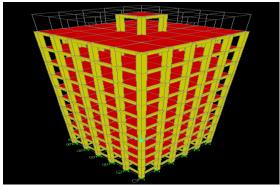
10 Storied Building With Water Tank – 3d View
